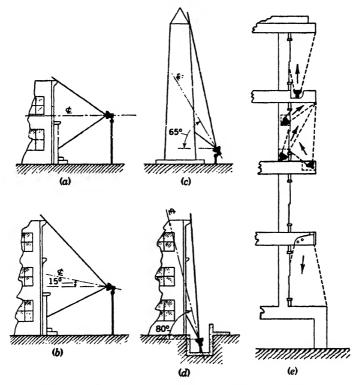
Typical arrangements and locations of outdoor floodlamps (a, b, c, d); and suggested arrangements (c) of incandescent or fluorescent lamps for lighting the exterior surfaces and cantilever floor extensions.
